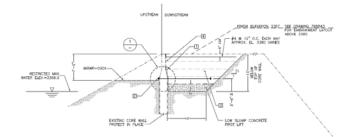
Typical Section, Main Dam Core Wall Improvements.
